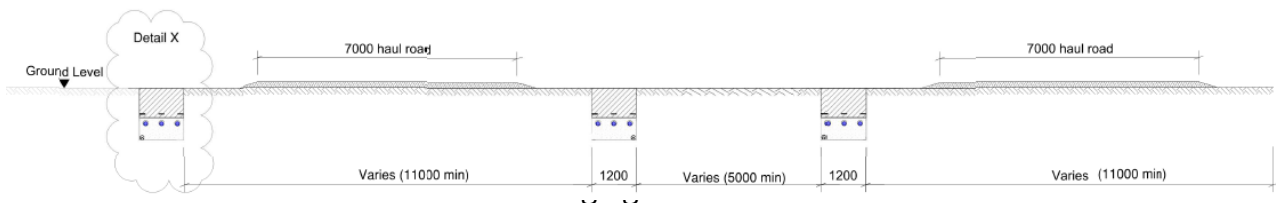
Illustrative cross section showing typical layout of trench provision for all three circuits forming UGC connection (dimensions in mm)
